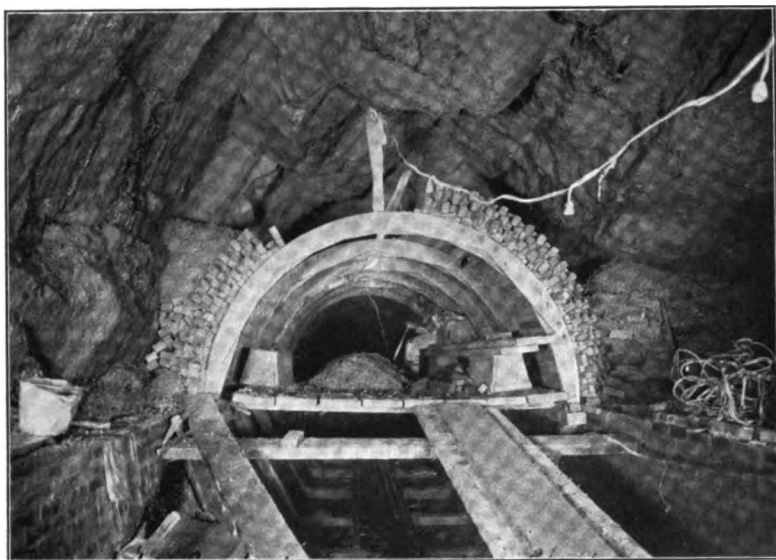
TORRESDALE CONDUIT—SOUTH HEADING, SHAFT NO. 10.
